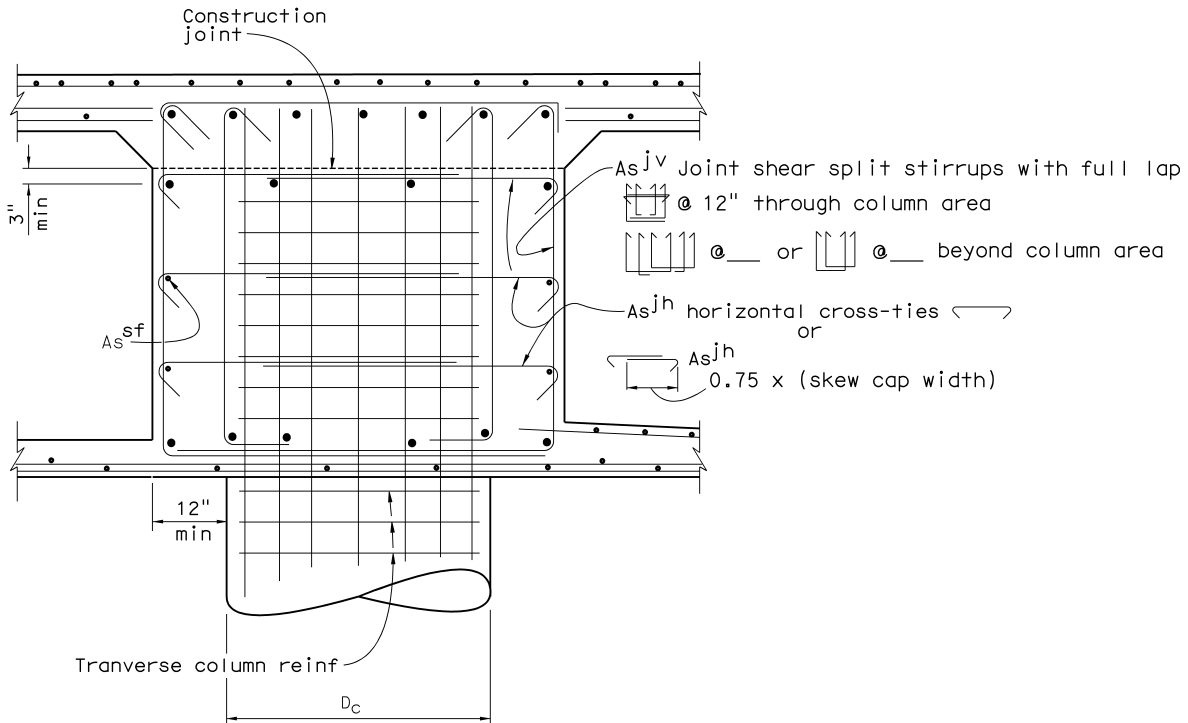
Joint Shear Reinforcement Details¹¹
